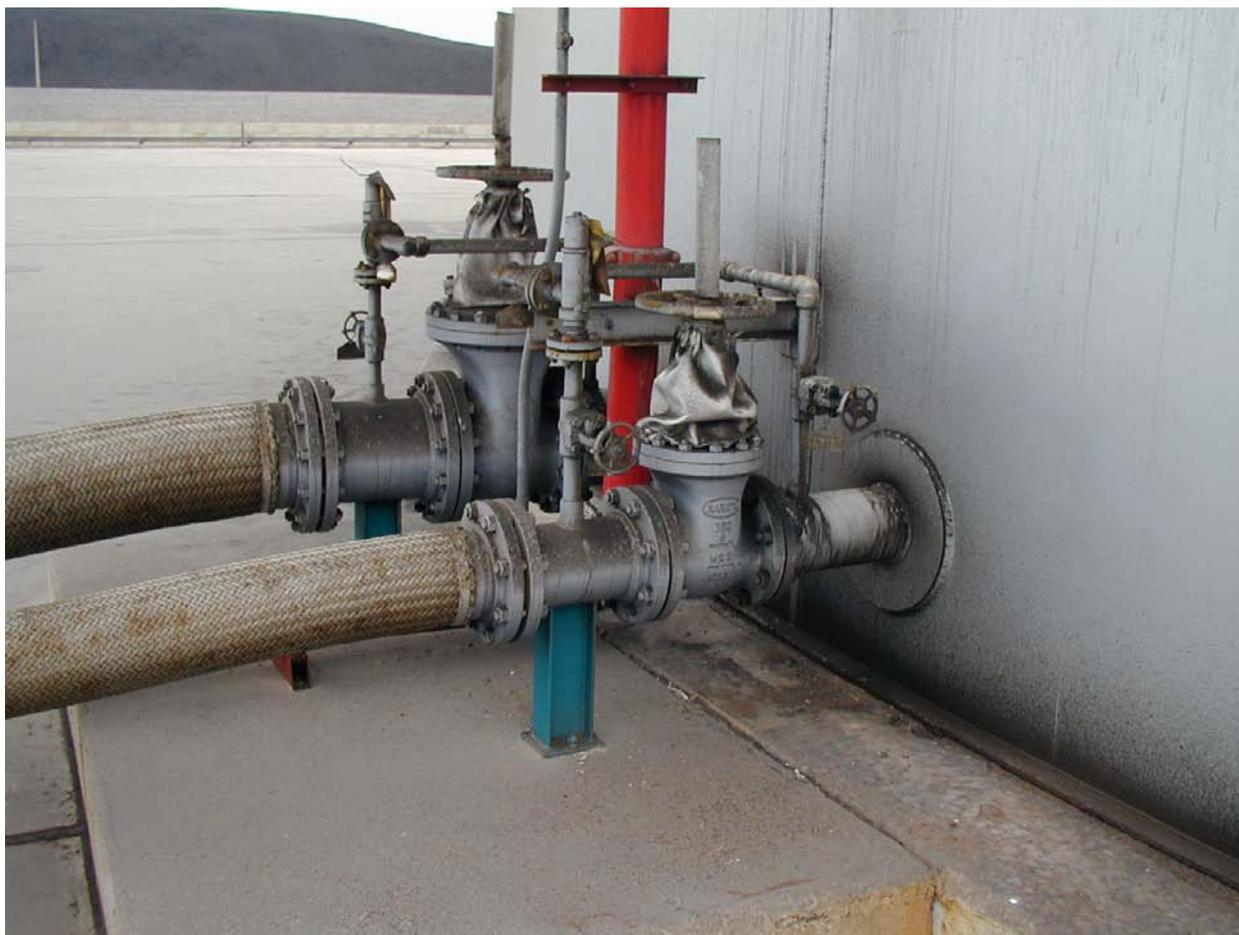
Flexible connections prevented piping damage in 2001 Peru Earthquake (Photo courtesy of Eduardo Fierro, BFP Engineers).
